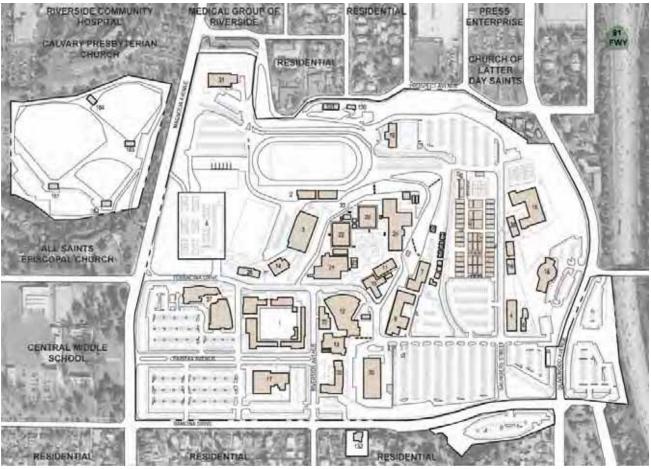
Existing Site Plan - Existing campus buildings and neighboring uses
